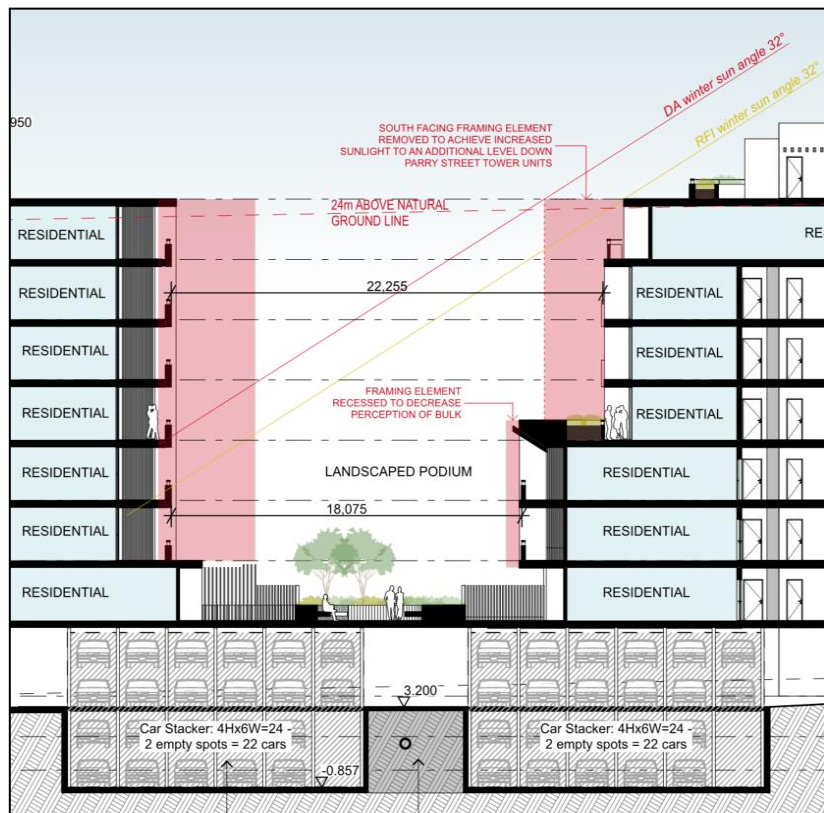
Extract from *Site Section* (drawing no: DA-301, issue no: 11, dated 14/5/2021) showing increased building separation – extent of building bulk original proposed shown in red.
